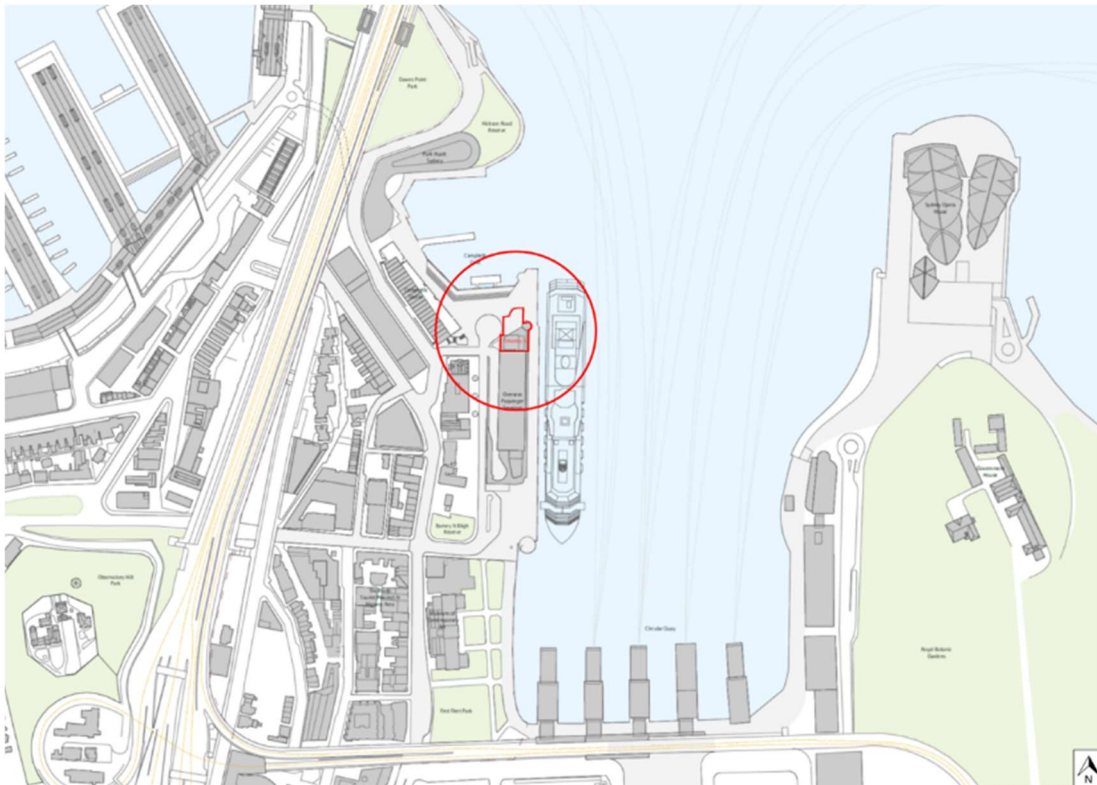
Site location – Tenancy 5 of the OPT building (Source: Collins and Turner)
